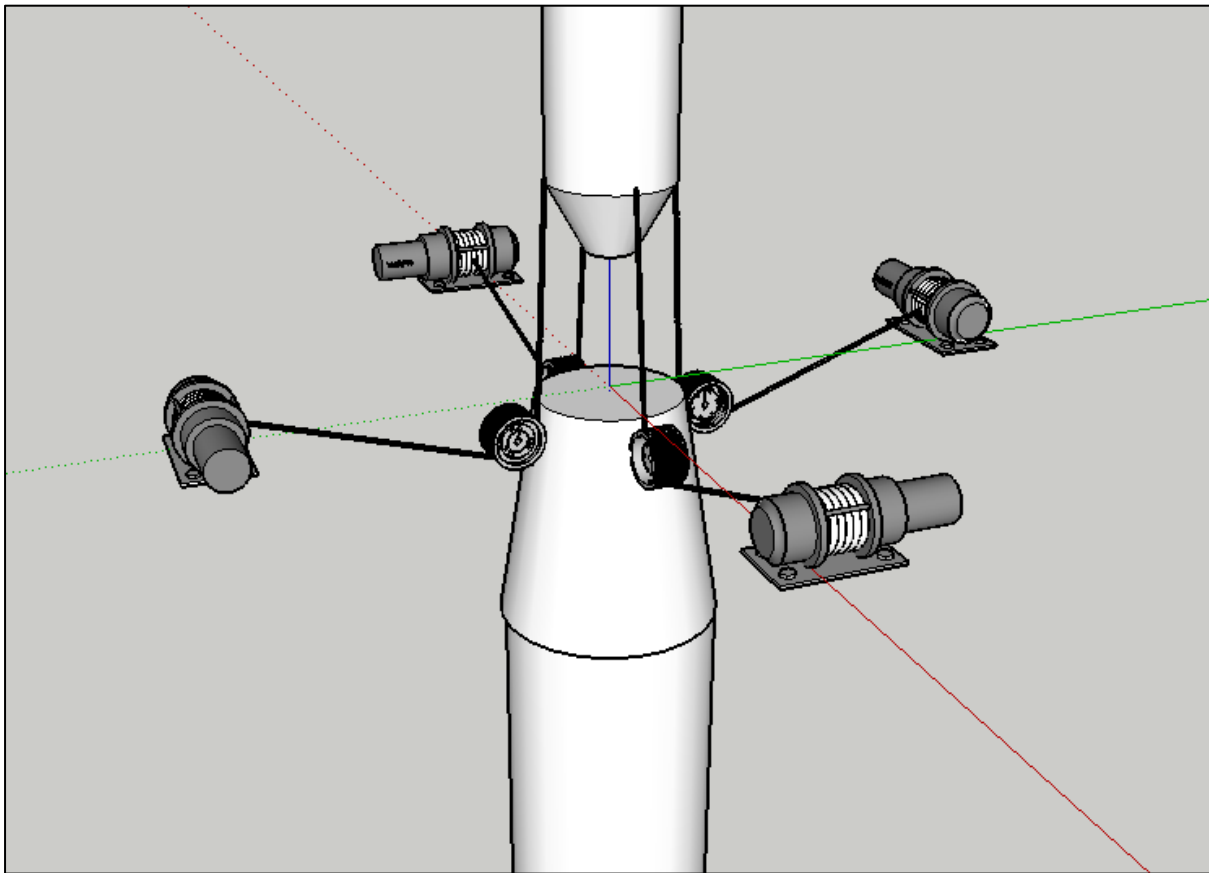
5 Proposed arrangement of winches connecting wires between spar buoy and Tower
